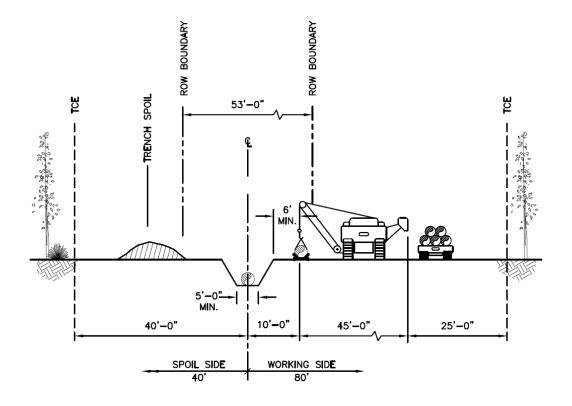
ASAP Typical Right of Way - Tundra Ice Road
